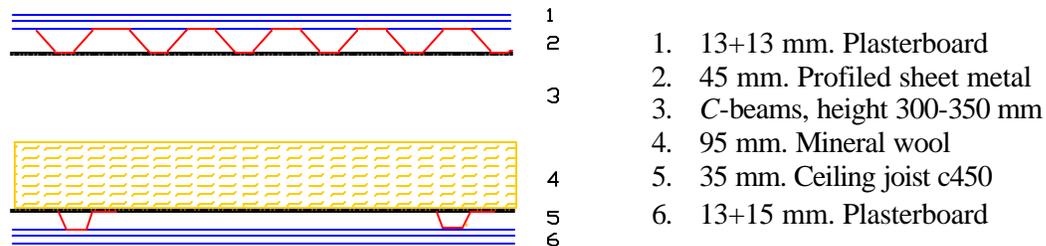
Design of the examined floor. The prefabricated elements have a width of 1.20m.
